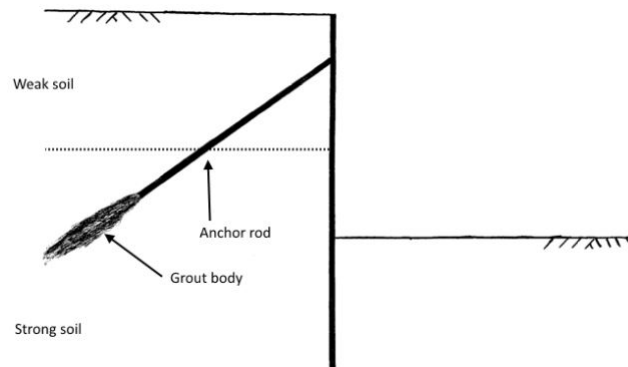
Cross sectional lay-out of a wale supported sheet pile (figure 40-1 from [2])(side view)
